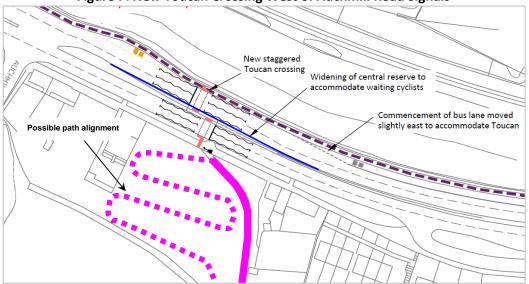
New Toucan Crossing West of Auchmill Road Signals
